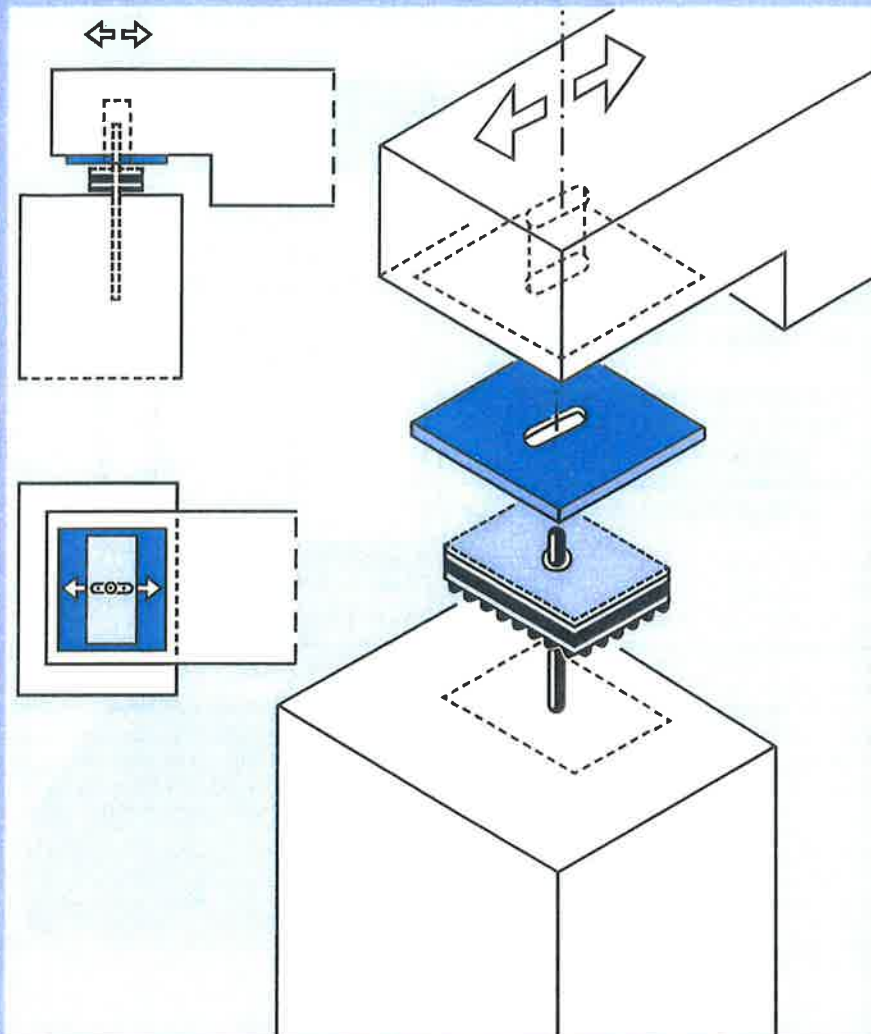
Installation of Ciparall® Sliding Bearing with bore hole and slotted hole
